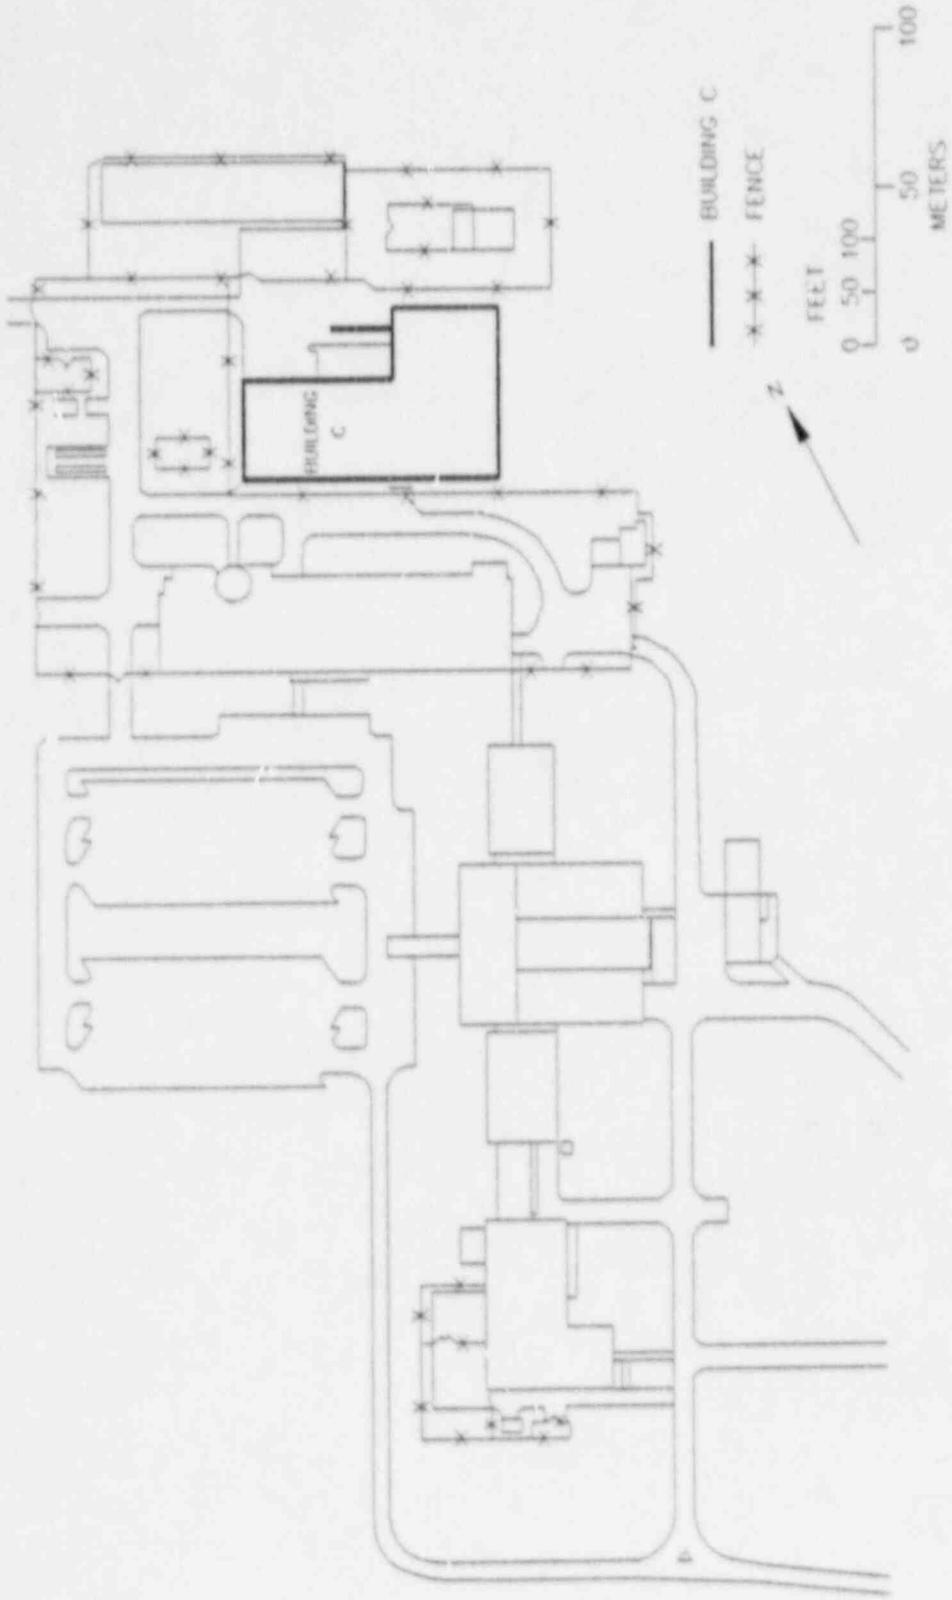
Plan View of the Lynchburg Research Center Indicating Location of Building C
